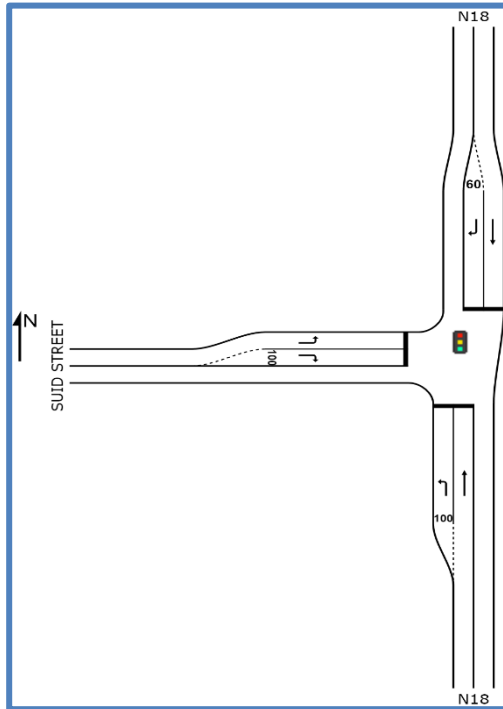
Proposed Layout of N18 and Suid Street Intersection
